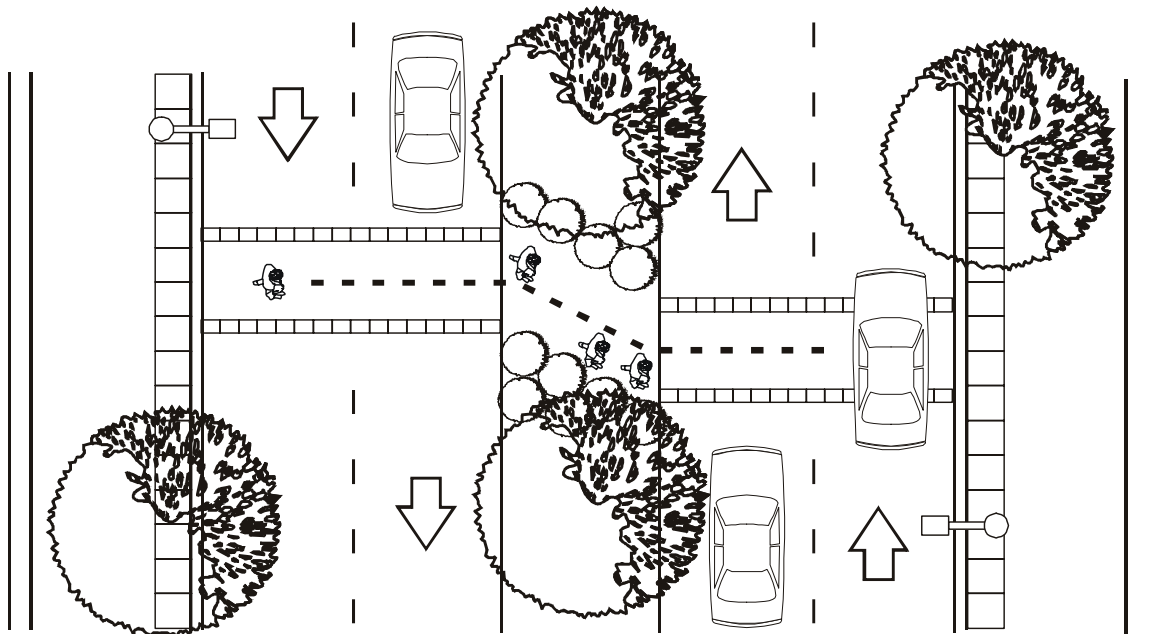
Illustration. Diagram of a staggered crossing configuration.
